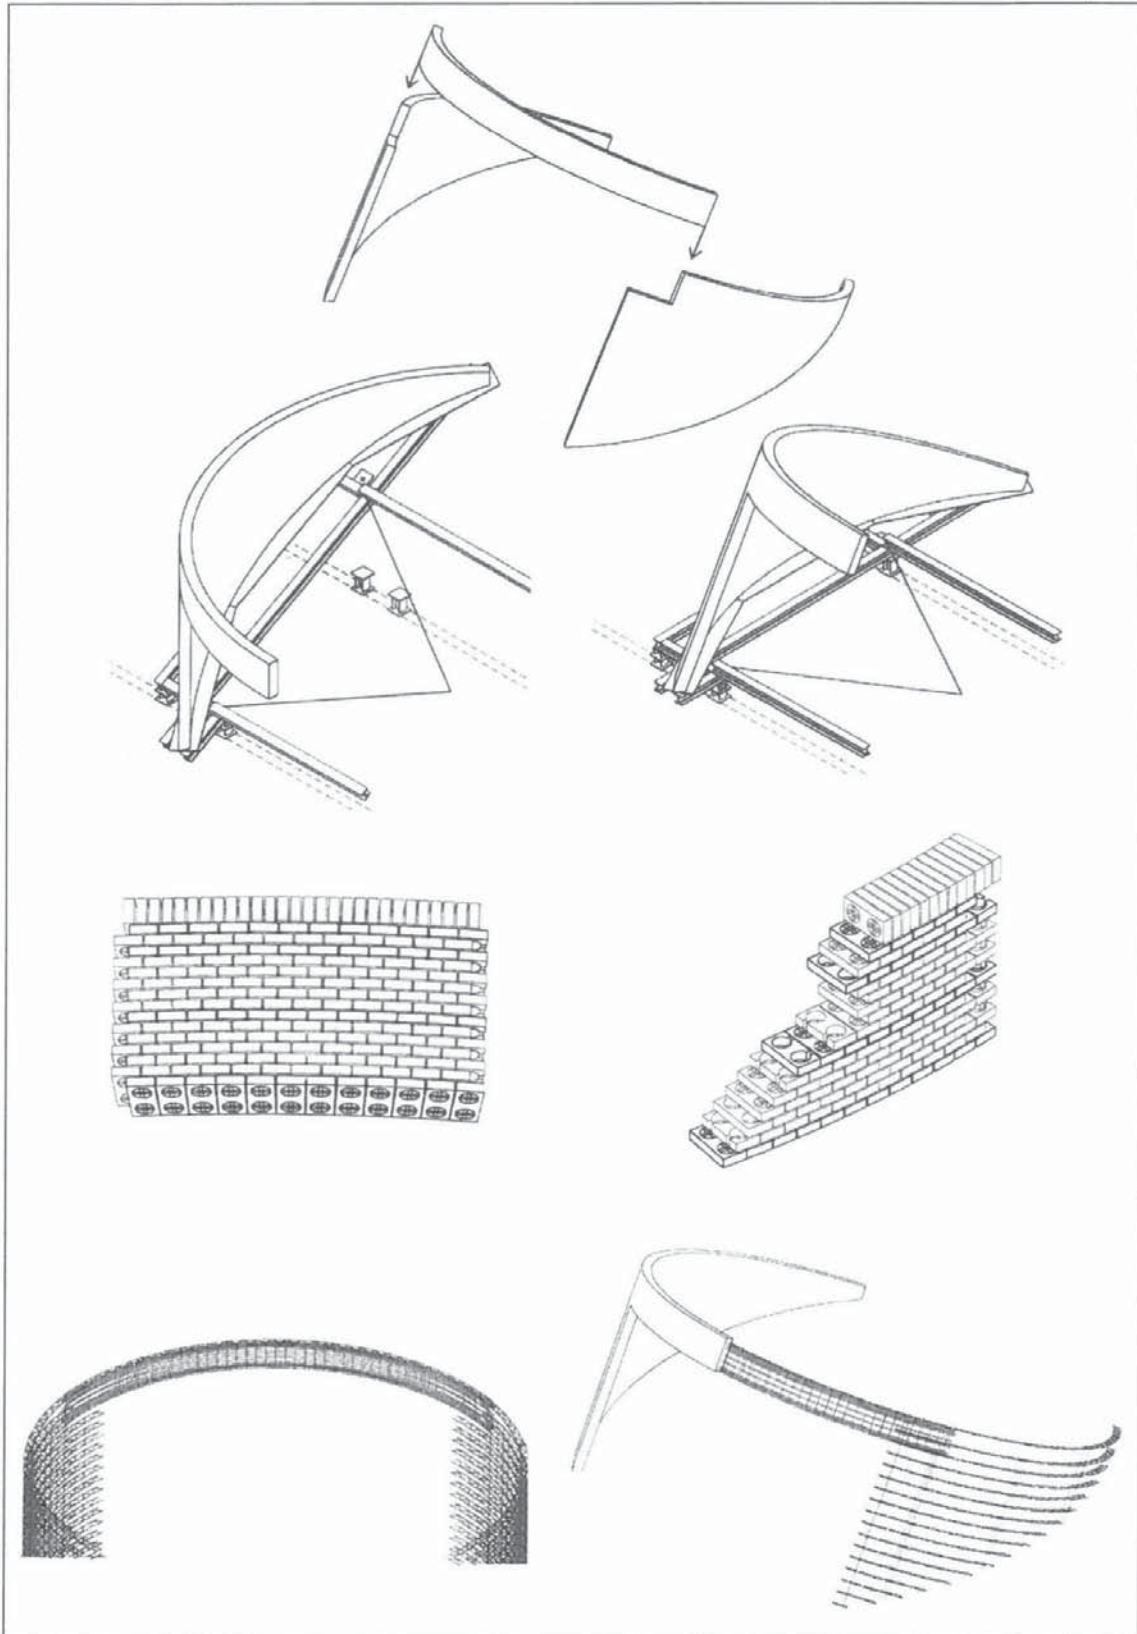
1st prefabricated option. Assembly in 3 parts.
